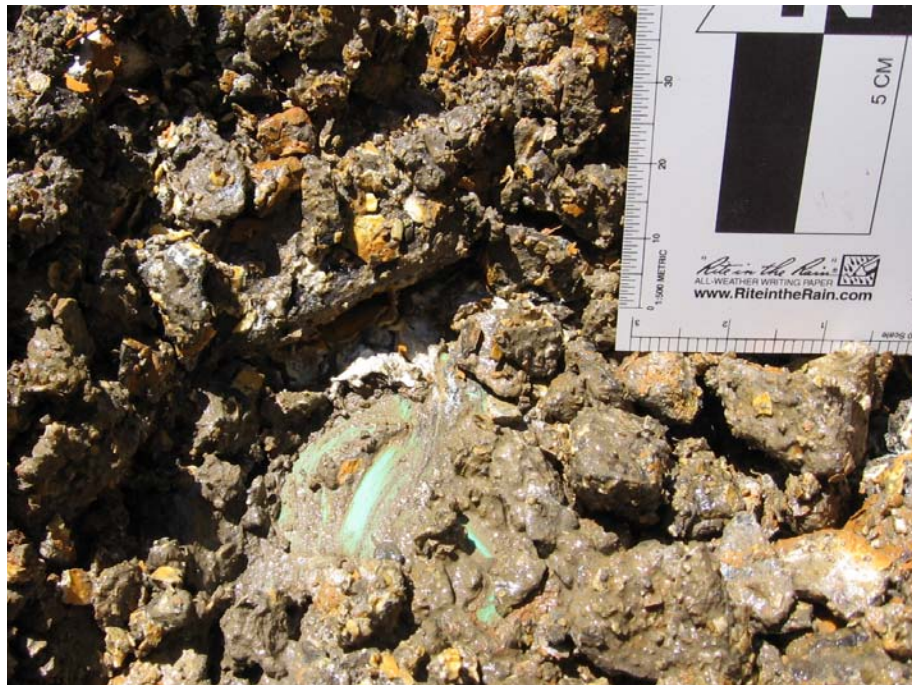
Exposed underdrain pipe in the Jonathan Run Box 1 system. Solids accumulation was evident immediately adjacent to perforations.
